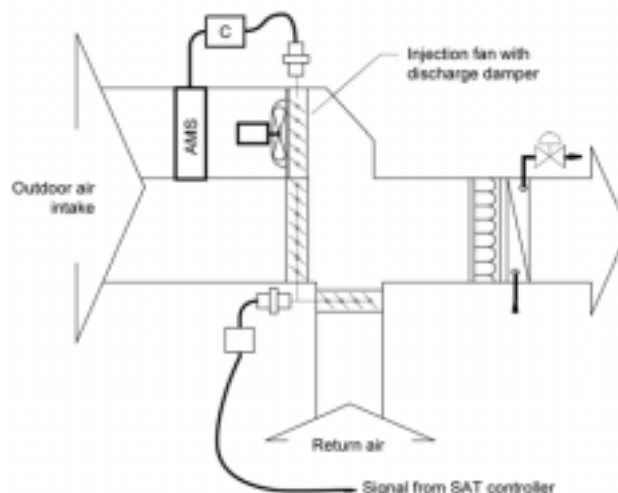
Injection Fan with Dedicated Minimum Outdoor Air Damper
